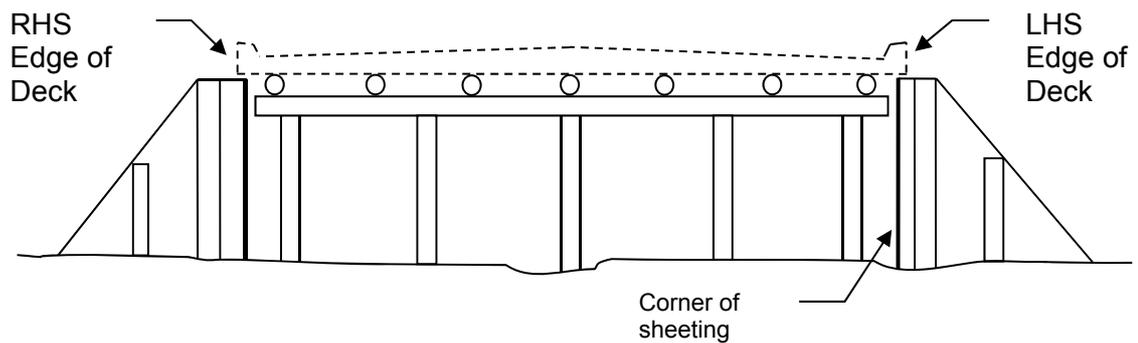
ELEVATION - ABUTMENT 1, ELEMENT SPACINGS
